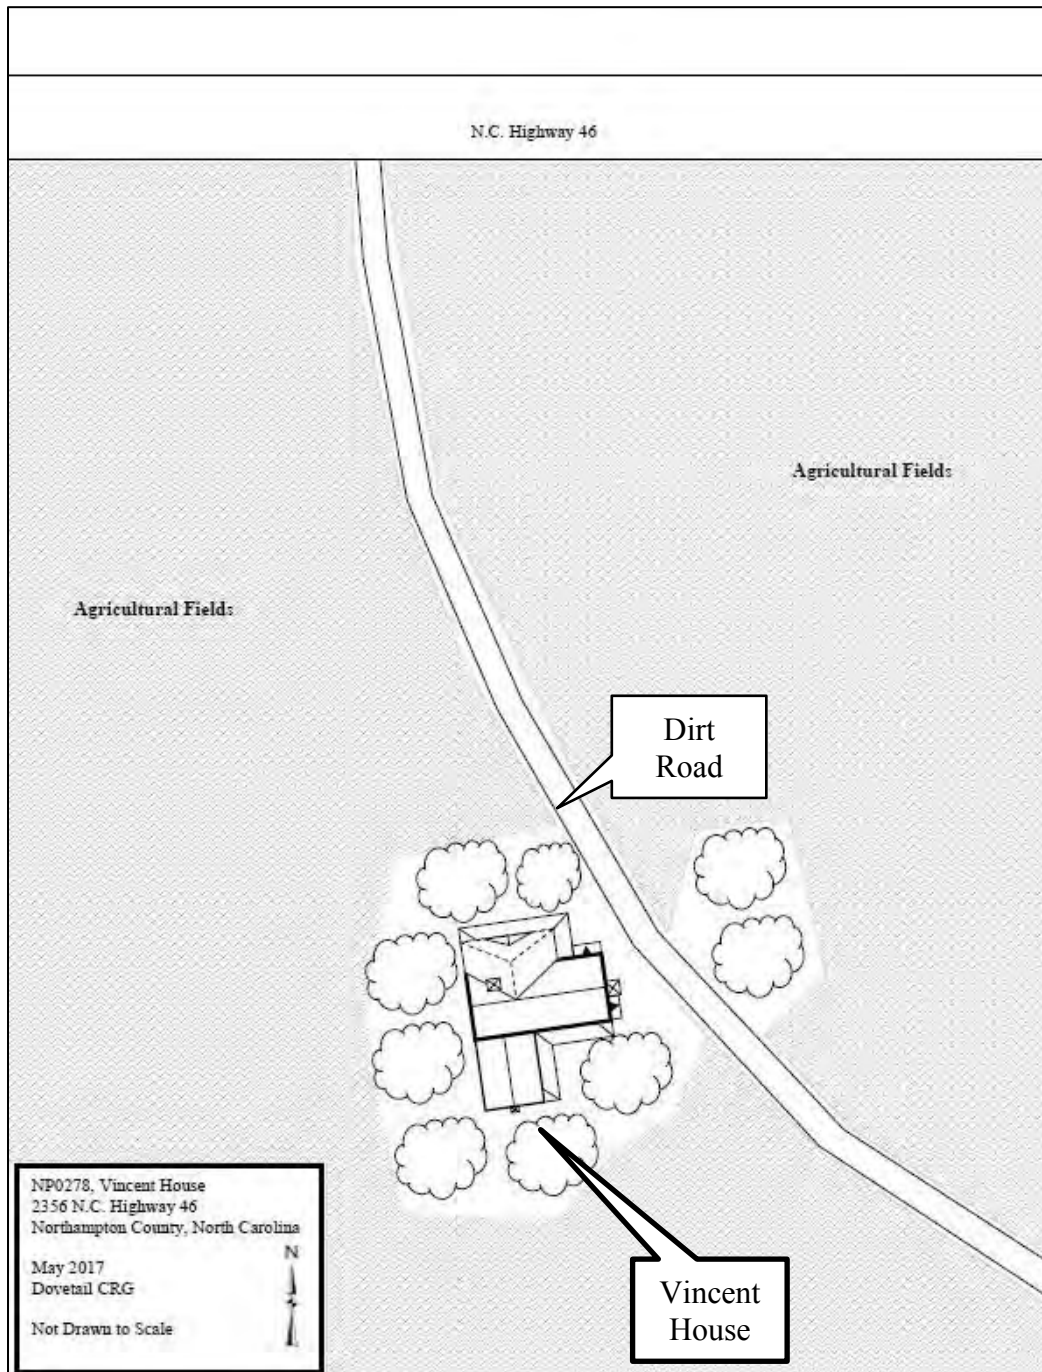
Vincent House (NP0278) Site Plan Based on Current Aerial Imagery and 1980 Survey.³³²
